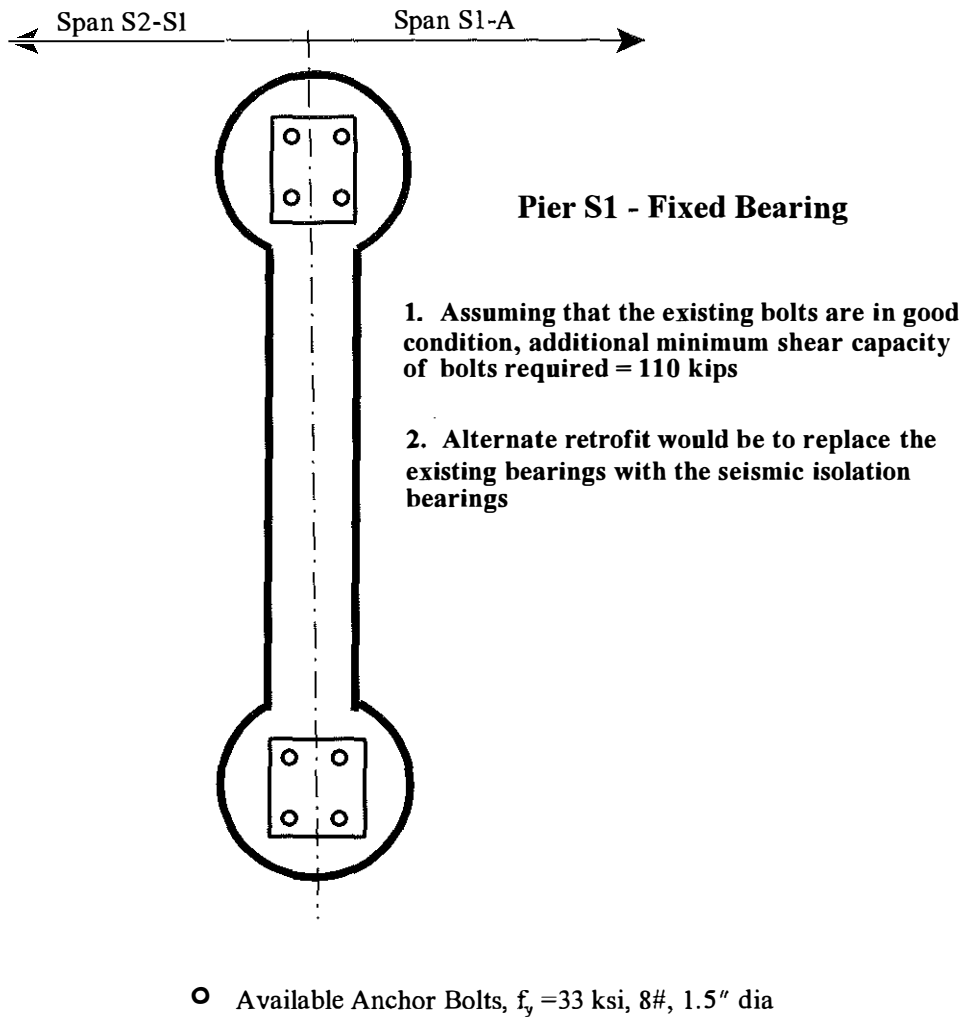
Minimum Required Shear Capacity ( $V_{req}$ ) to be Provided by Additional Anchor Bolts at Bearings of the Pier S1 on the Henderson, KY Approach on the US41 Southbound Bridge
